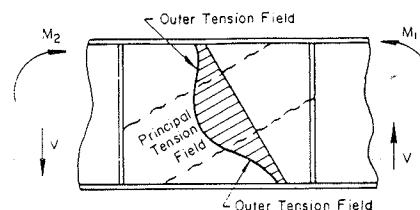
Typical transversely stiffened plate-girder web-plate panel under combined moment and shear.
